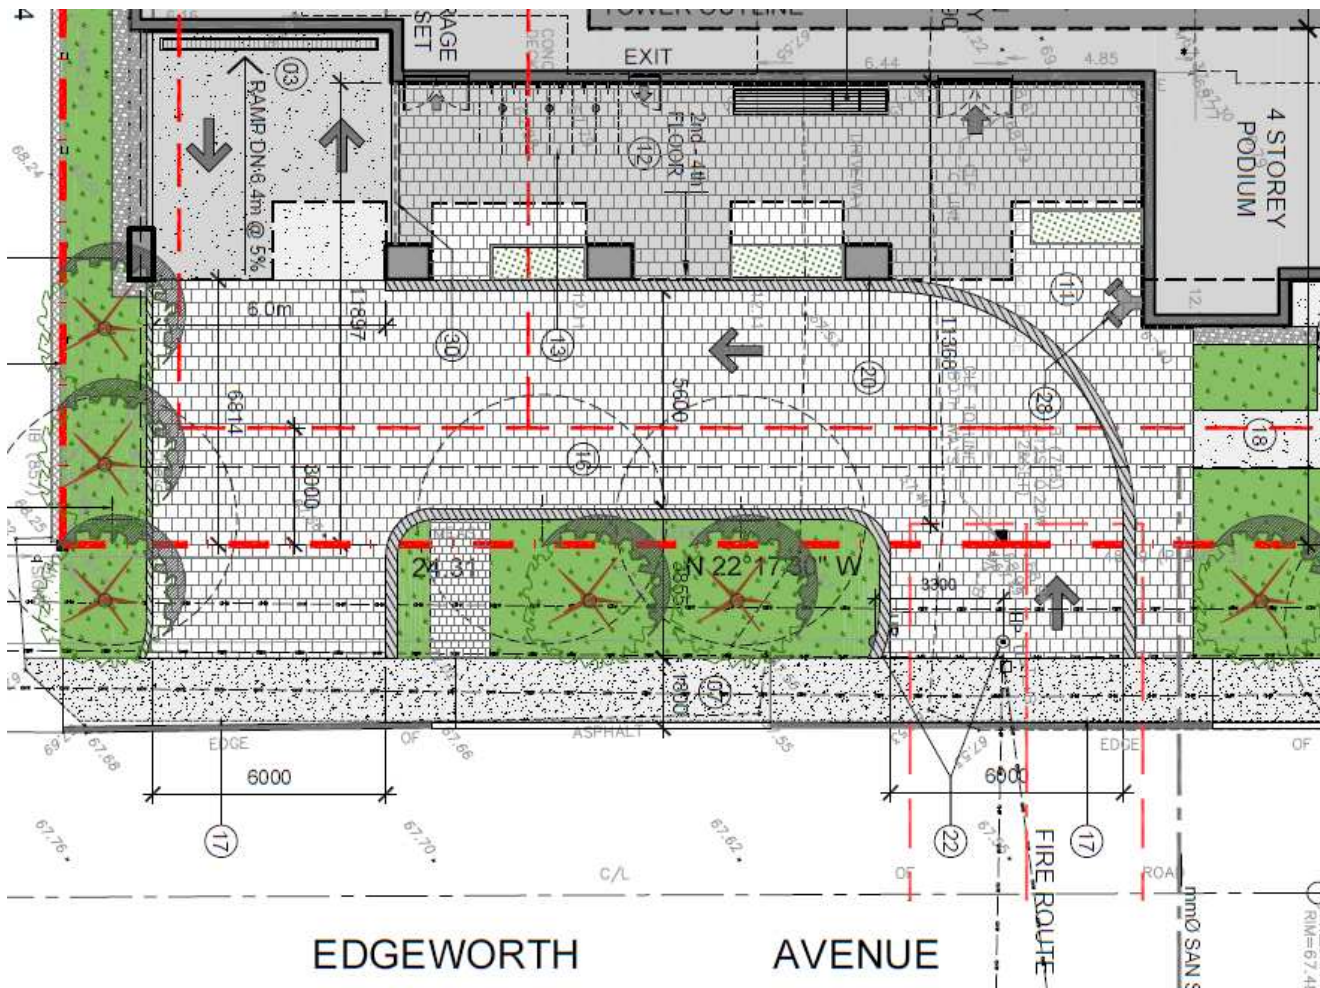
Excerpt from Site Plan, highlighting the vehicular access points (Source: RLA Architecture)
